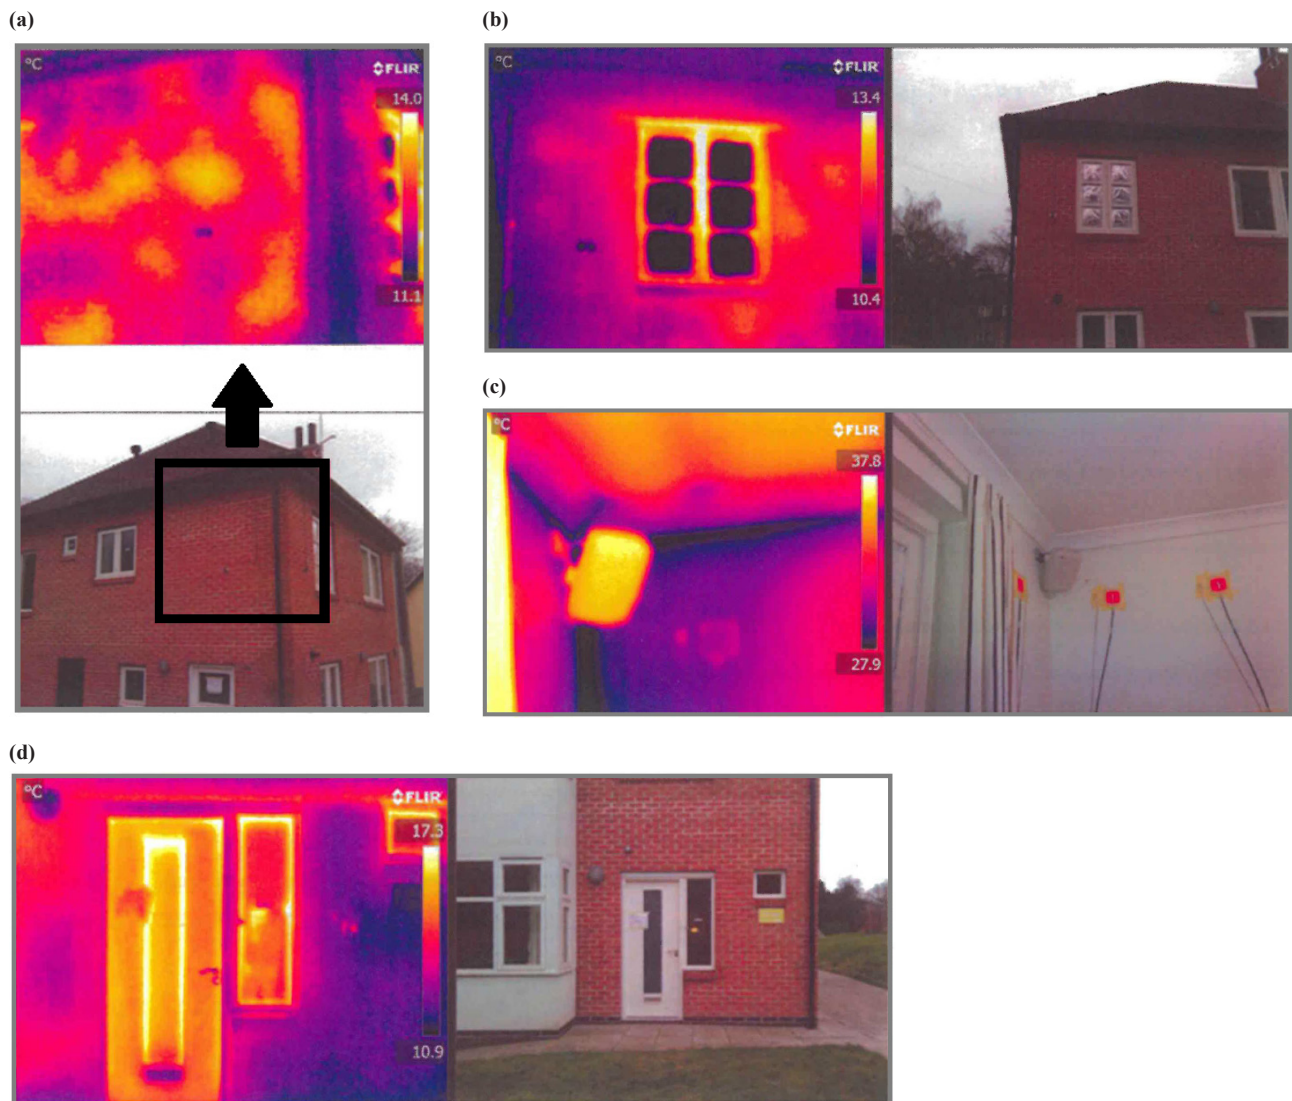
a) Thermal image of west wall, b) Thermal image of south wall, and the window covered with reflective coil, c) Thermal image of the west-south wall ceiling junction, d) Thermal image of the front door and side window panel
